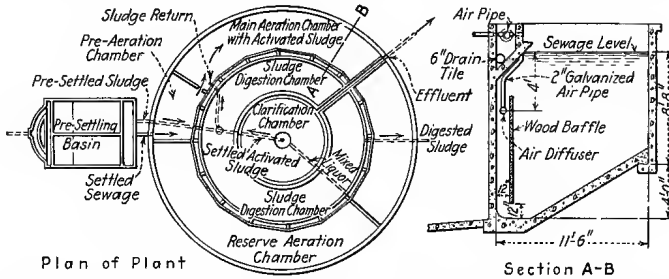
Plan and sectional detail of activated-sludge plant at Mercedes, Tex.
